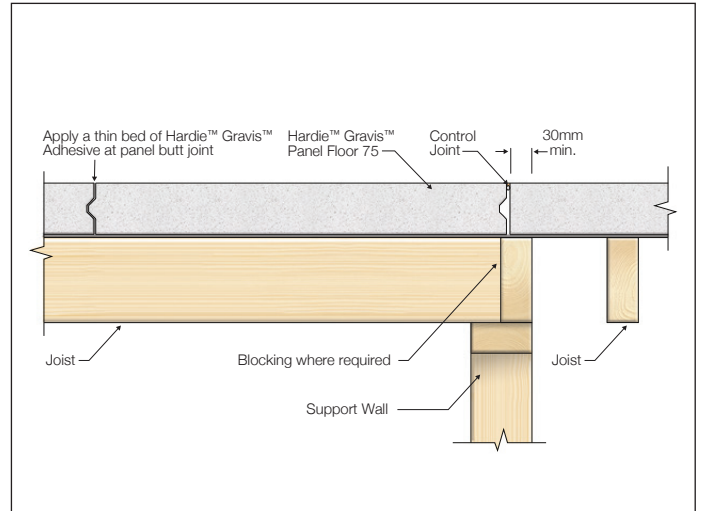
CONTROL JOINT LOCATION FOR CHANGE IN JOIST ORIENTATION
